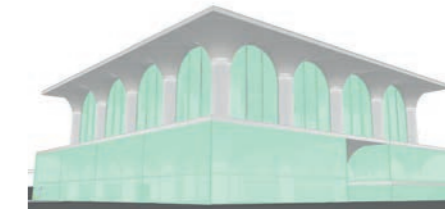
Perspective of arched windows and point supported glass facade (modelled by Spencer Culhane)
